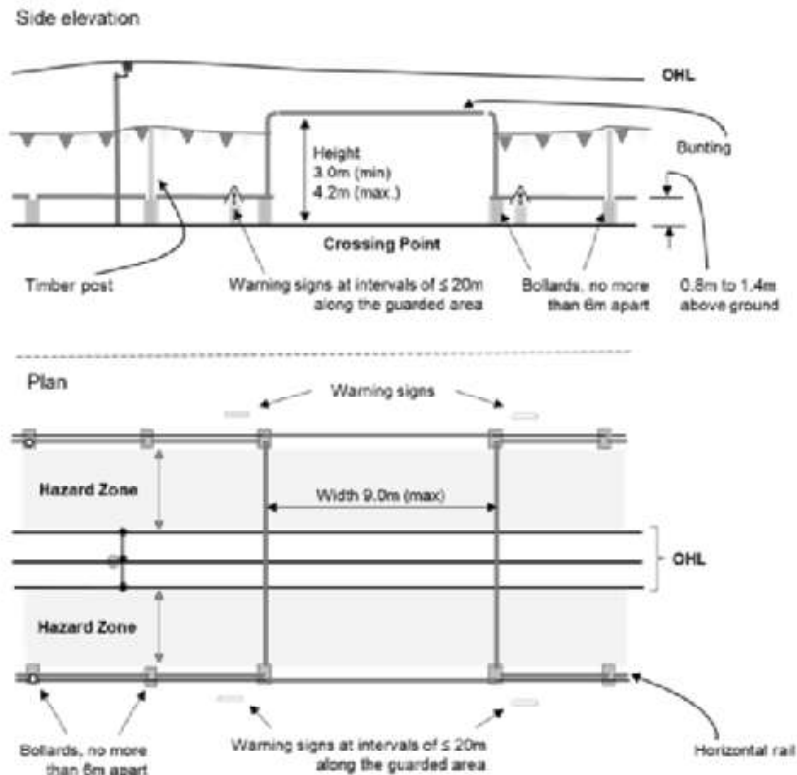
Illustration – Elevation and plan for a site where plant and machinery must not pass under overhead line.
